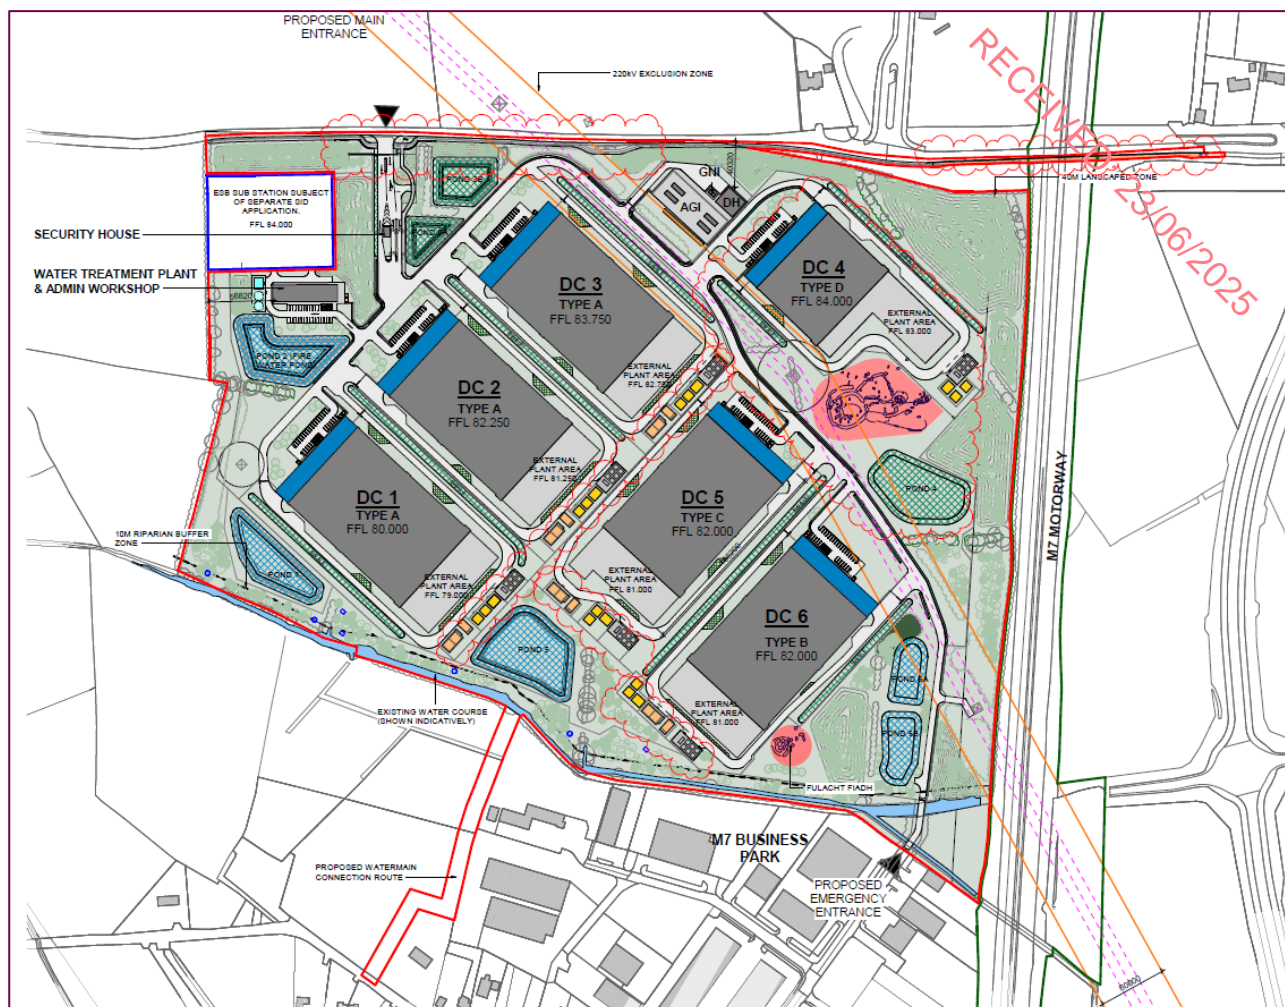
Amended Overall Proposed Site Plan (extract of now submitted drawing 22217-RKD-ZZ-ZZ-DR-A-1010-OVERALL PROPOSED SITE PLAN)
